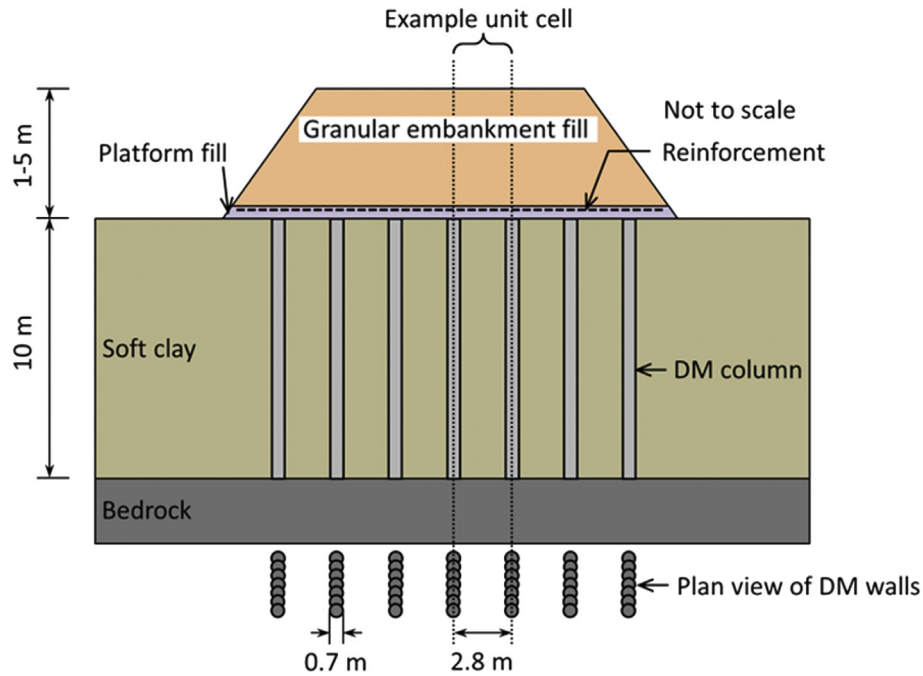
Schematic showing a full-width model of a GRCs embankment with DM column walls.
